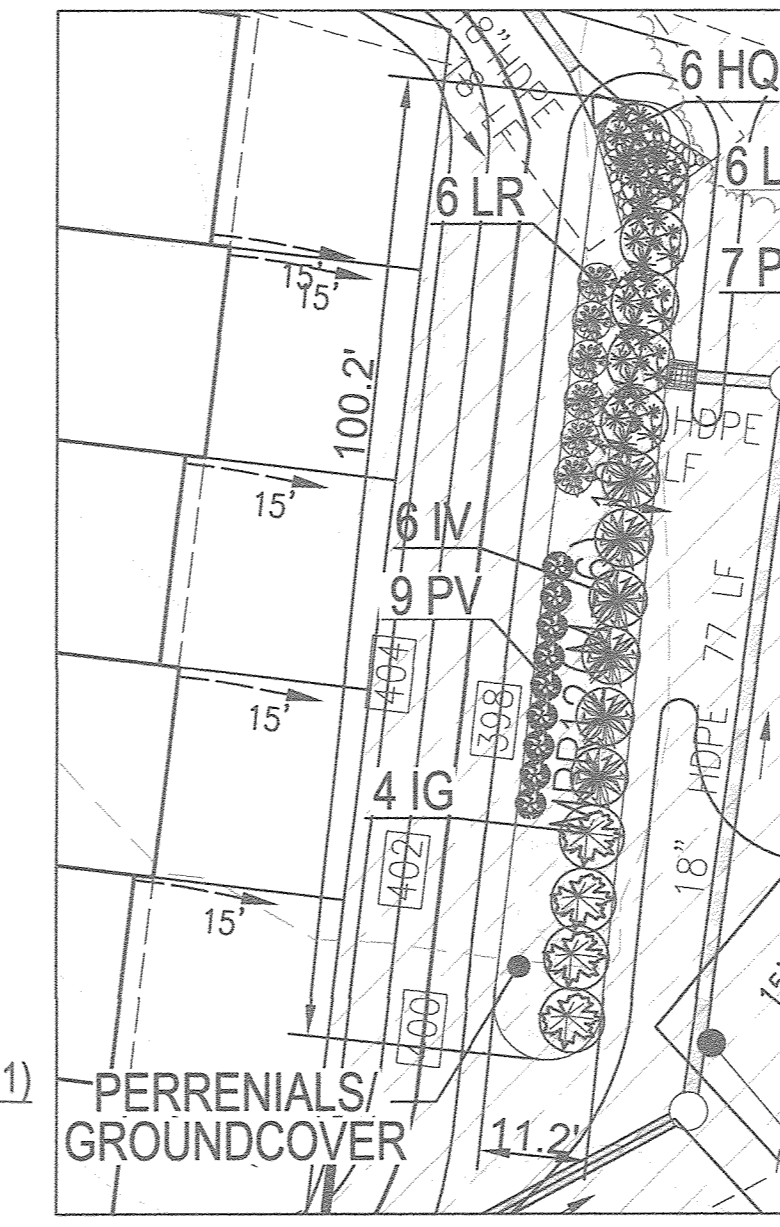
DETAILED BIO AND PLANTING PLAN (SWM #9)
